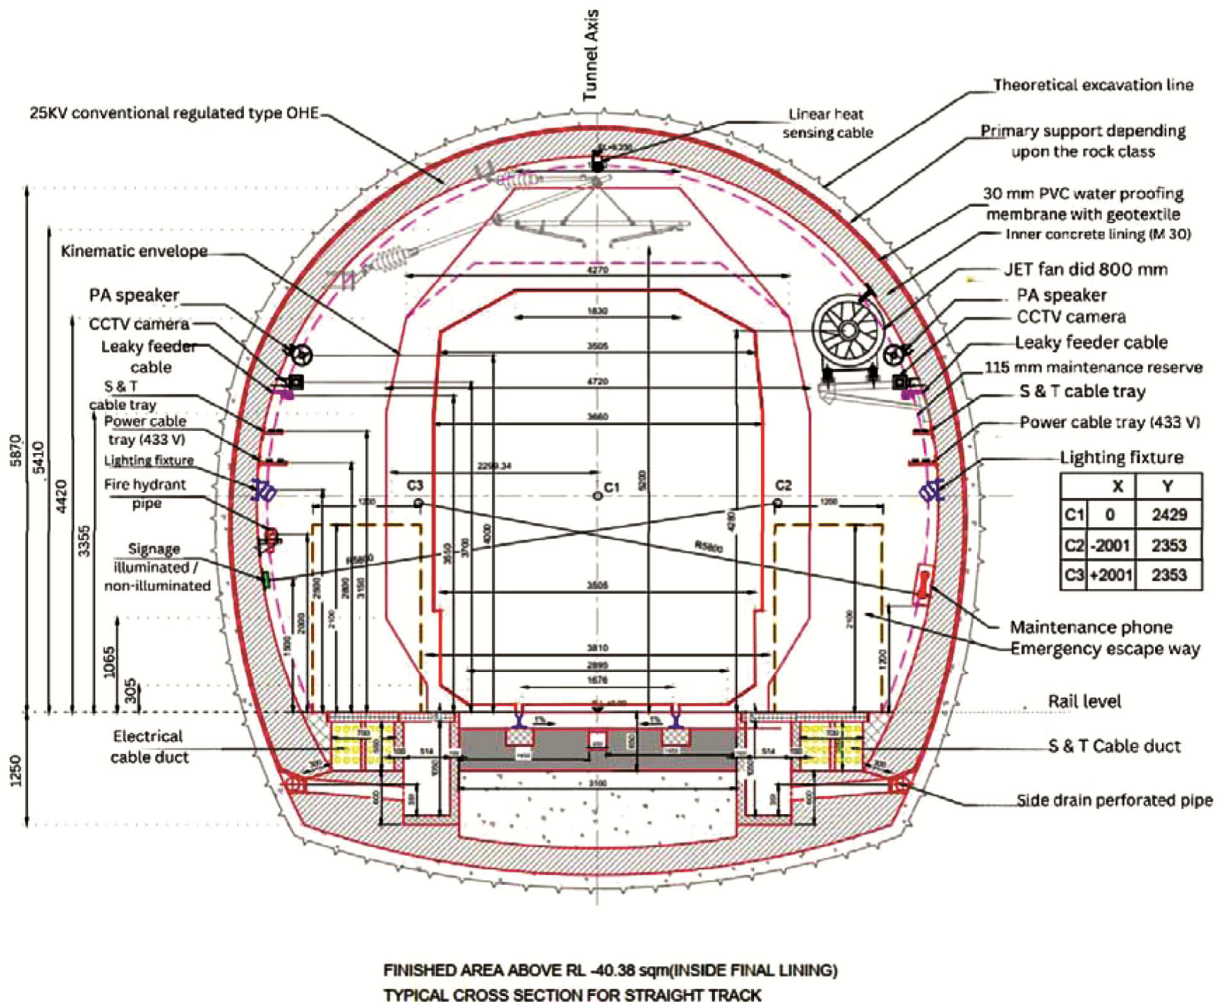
Typical cross – section of the proposed main tunnel for straight track (with invert)
